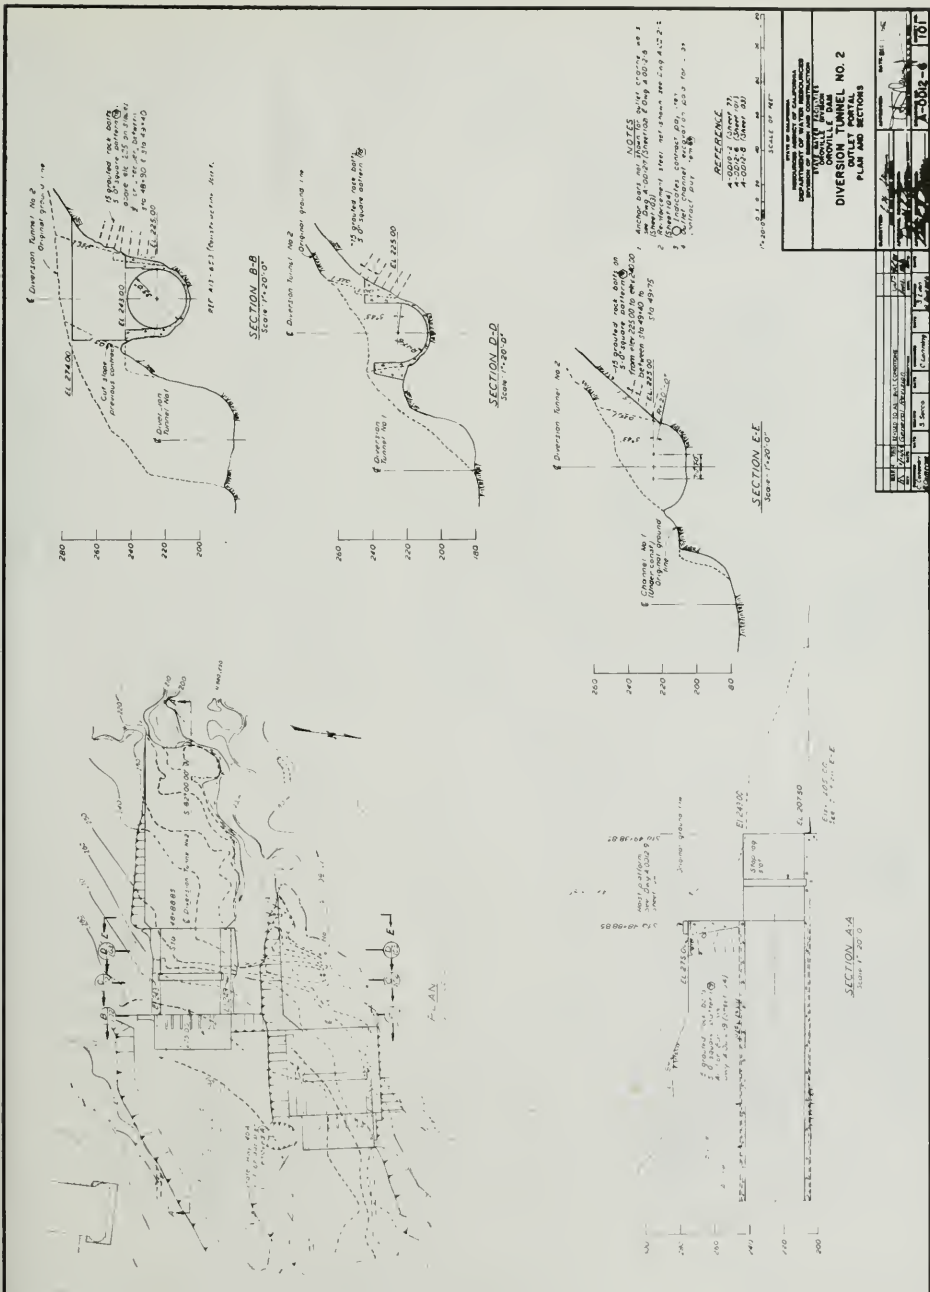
Diversion Tunnel Outlet Structures—Plan and Sections
